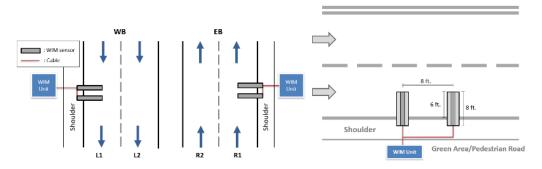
Portable WIM Installation Schematic Plan for Outside Lane.
